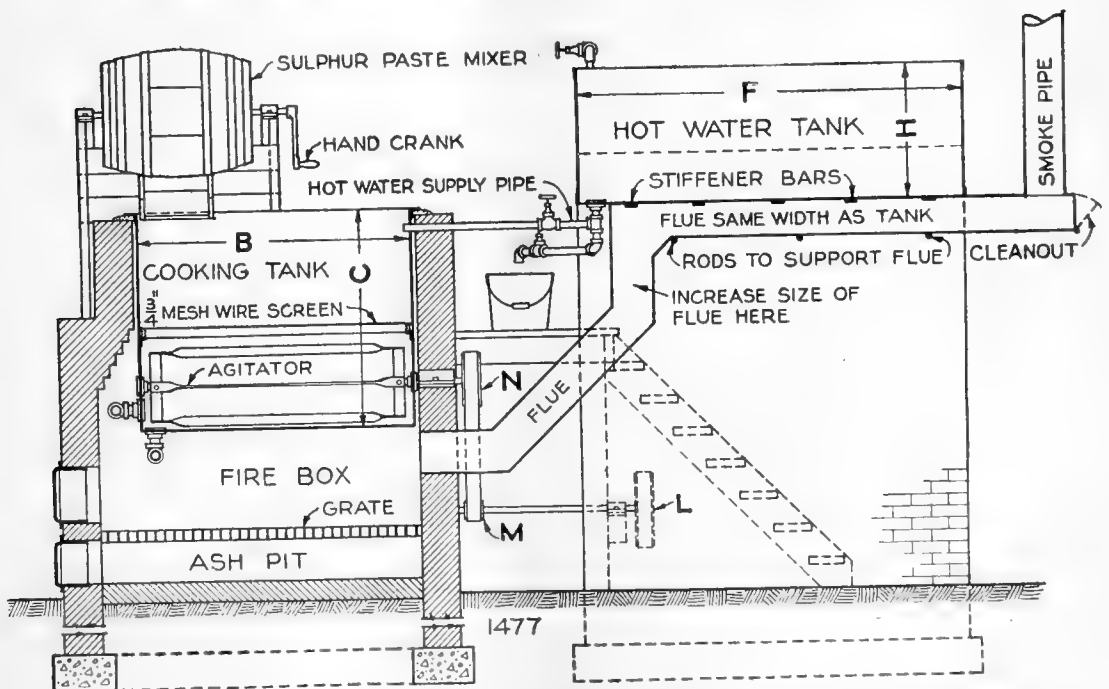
Sectional view of single-cooker furnace type of lime-sulphur plant.
